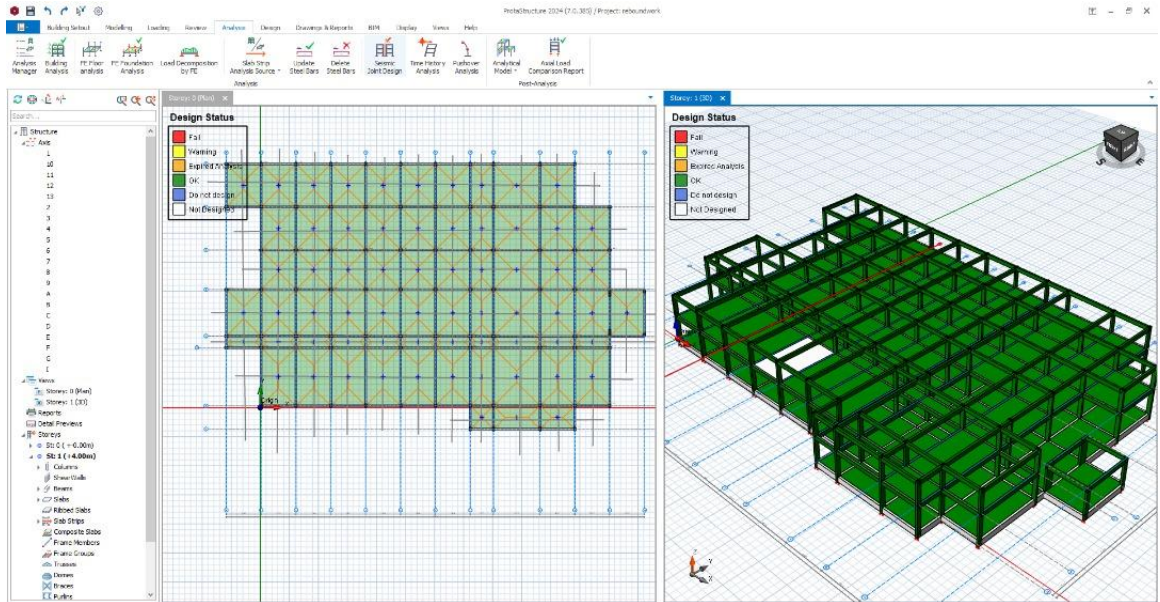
ProtaStructures design showing Design Status of Structural Plan And 3D Model for the Study Building (Storey 1)
